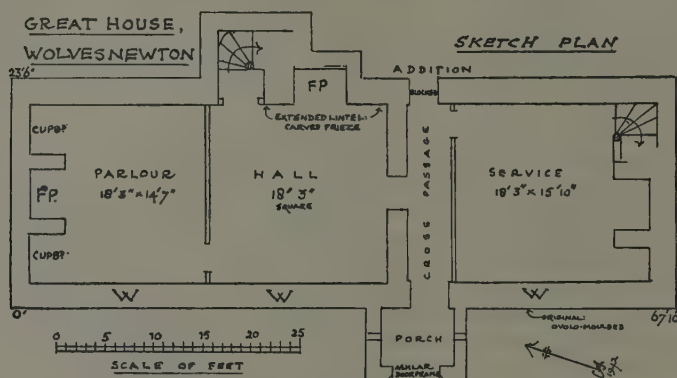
PLAN OF GREAT HOUSE, WOLVESNEWTON
